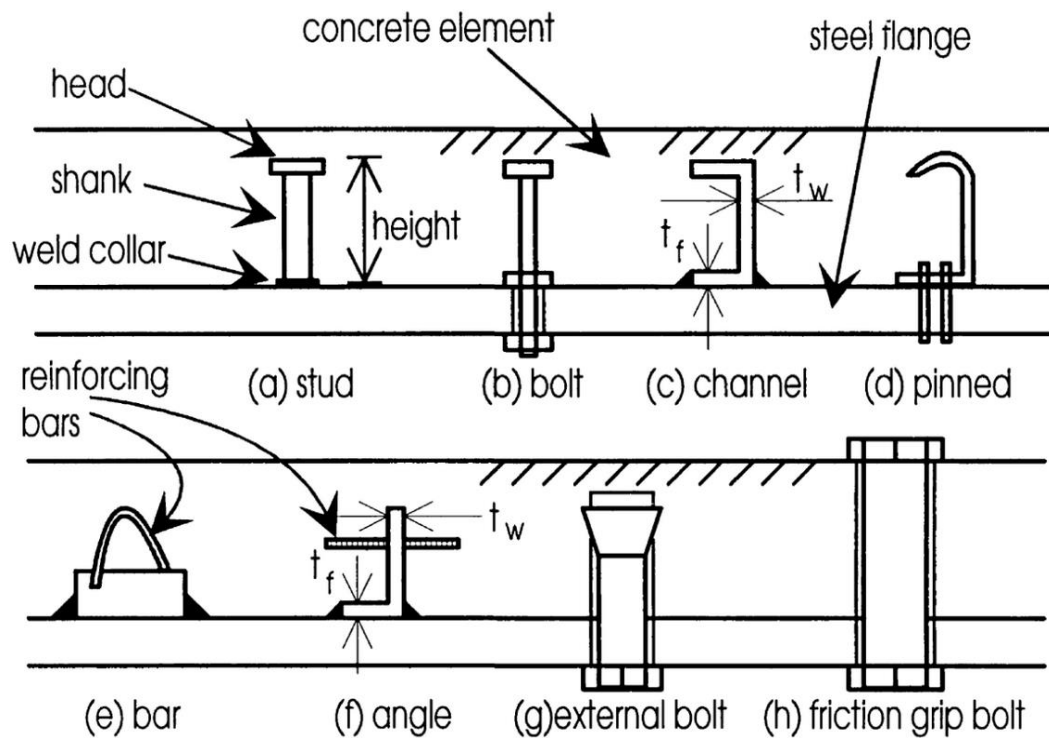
Shear connector types used in composite constructions (Oehlers and Bradford, 2013)
